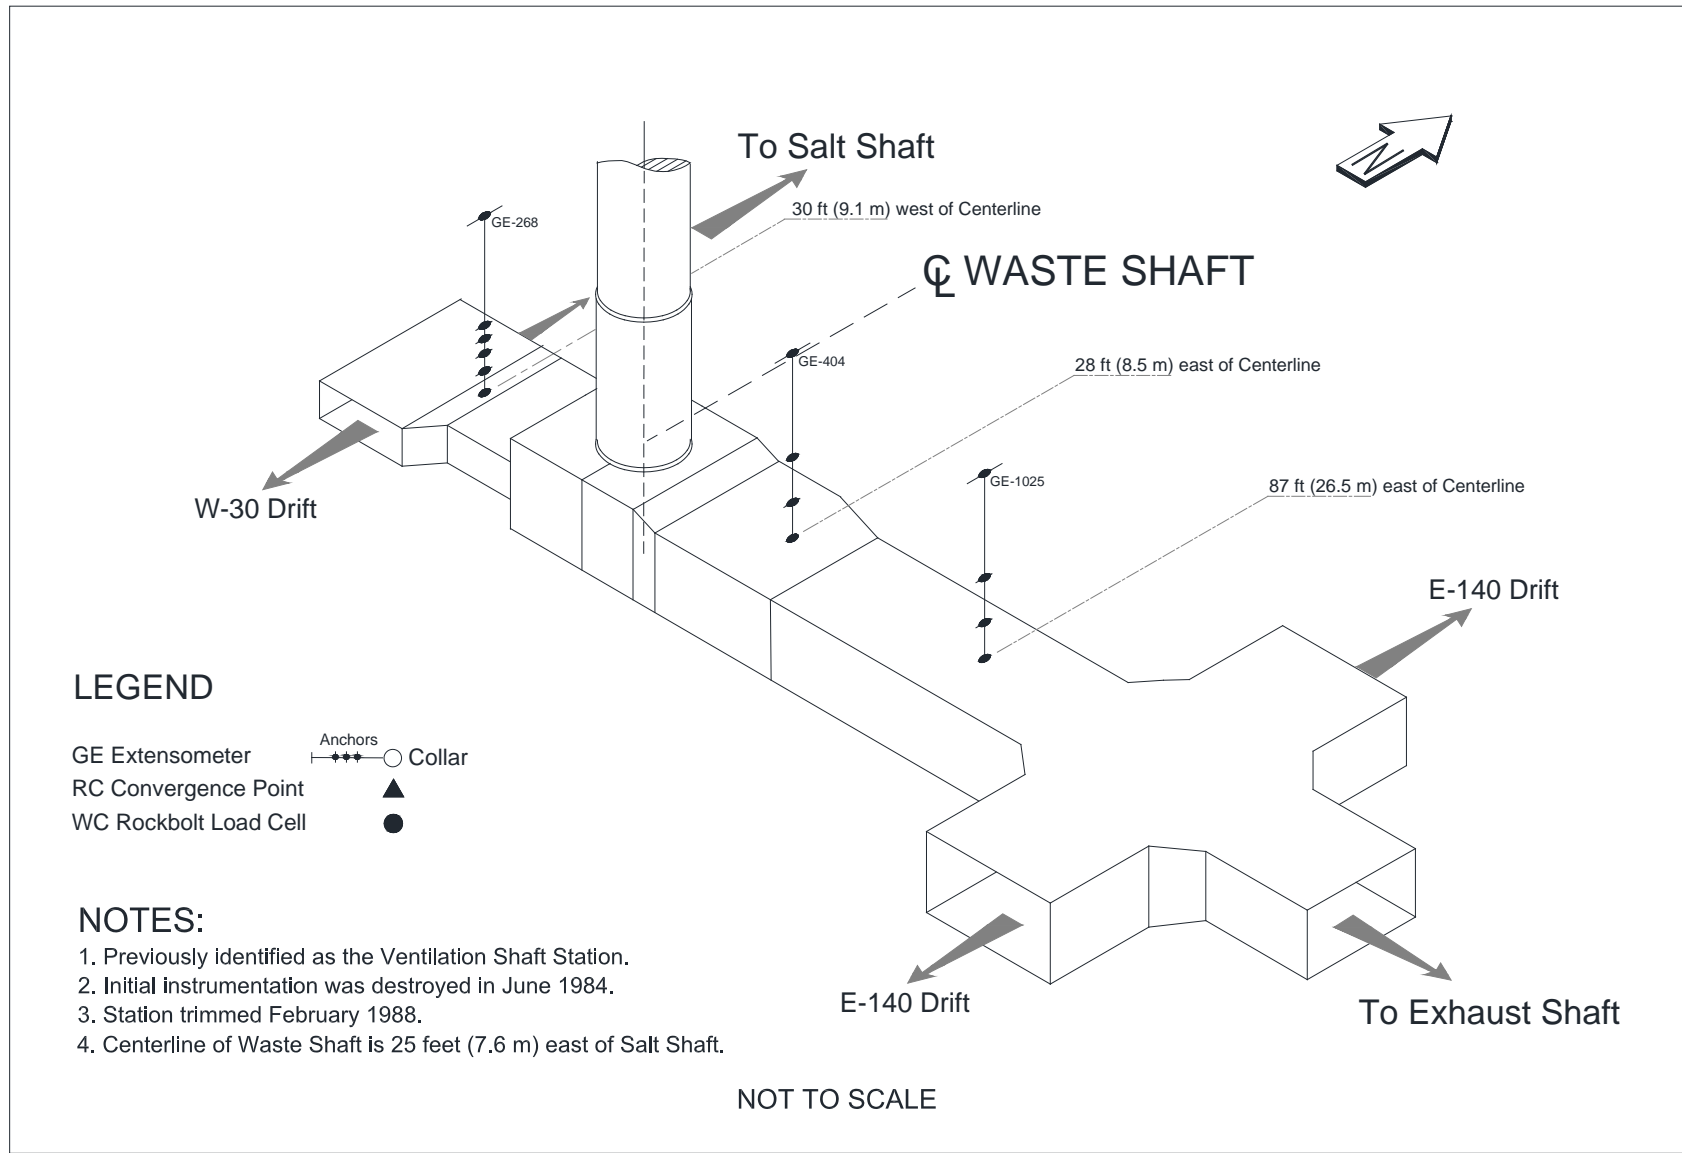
4 Waste Shaft Station Instrumentation after Roof Beam Excavation
